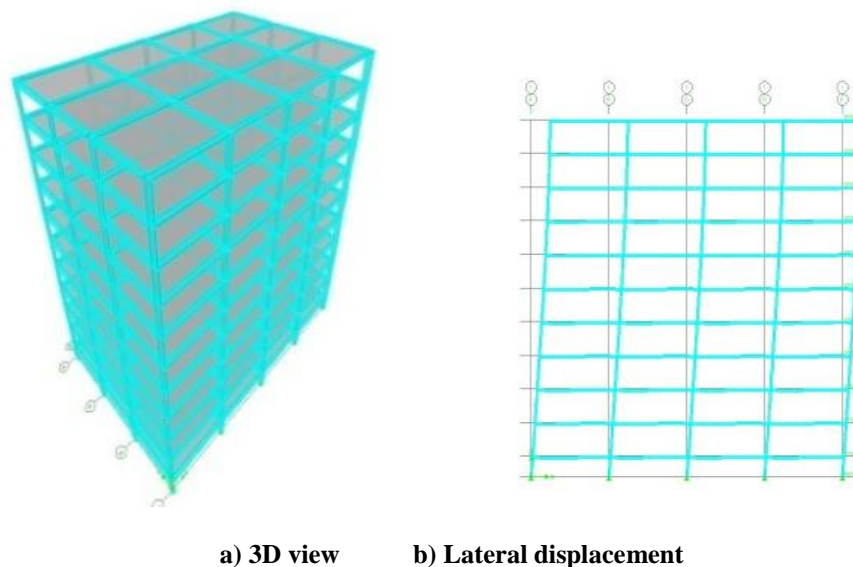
Model 2: G+10 RC bare frame building with slab element
